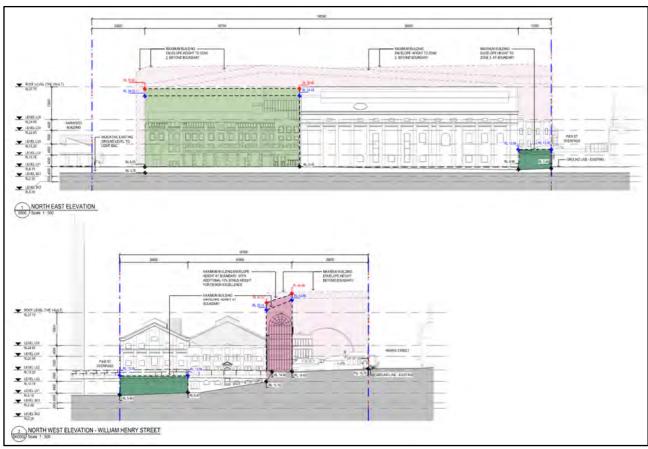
Building Envelope Zones Section Views (John Wardle Architects)
